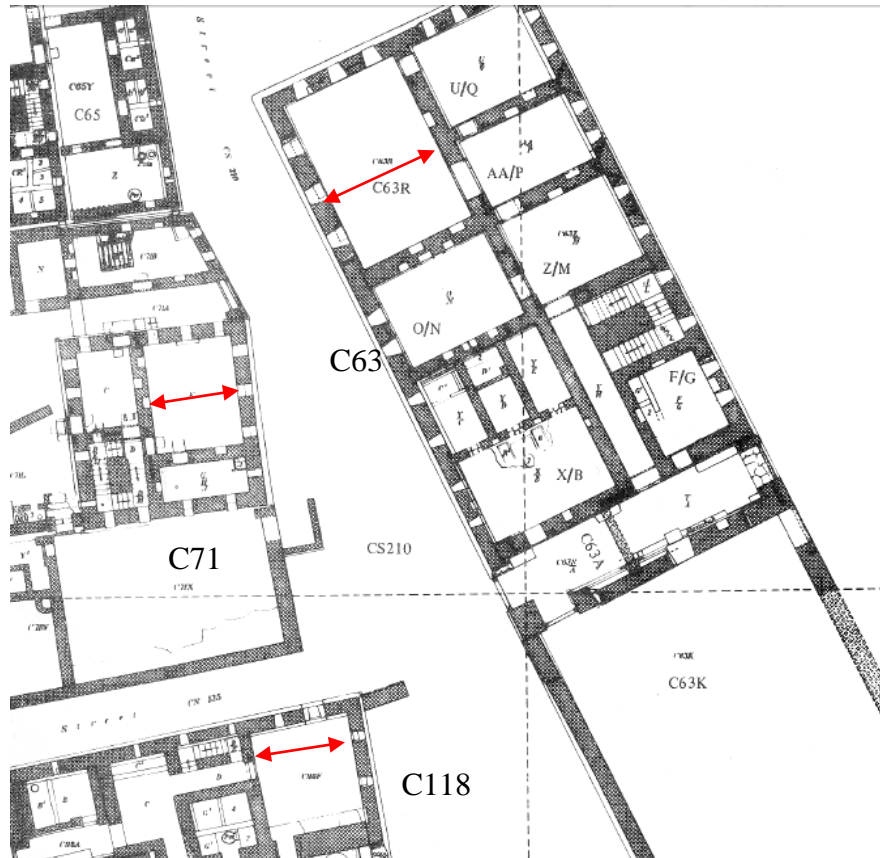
Detail of C layer Map, detailing rooms of C71, C63, and C118, three of the widest roof spans in Karanis.
